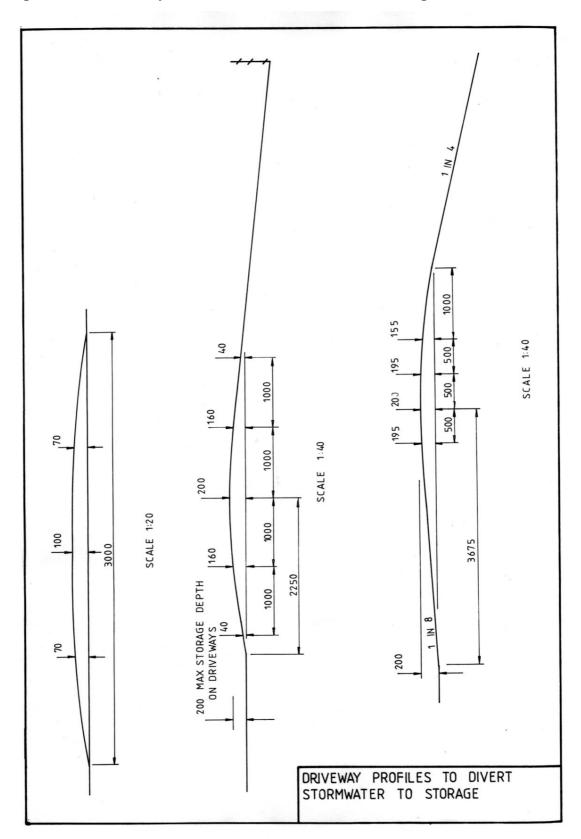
Driveway Profiles to Divert Stormwater to Storage
